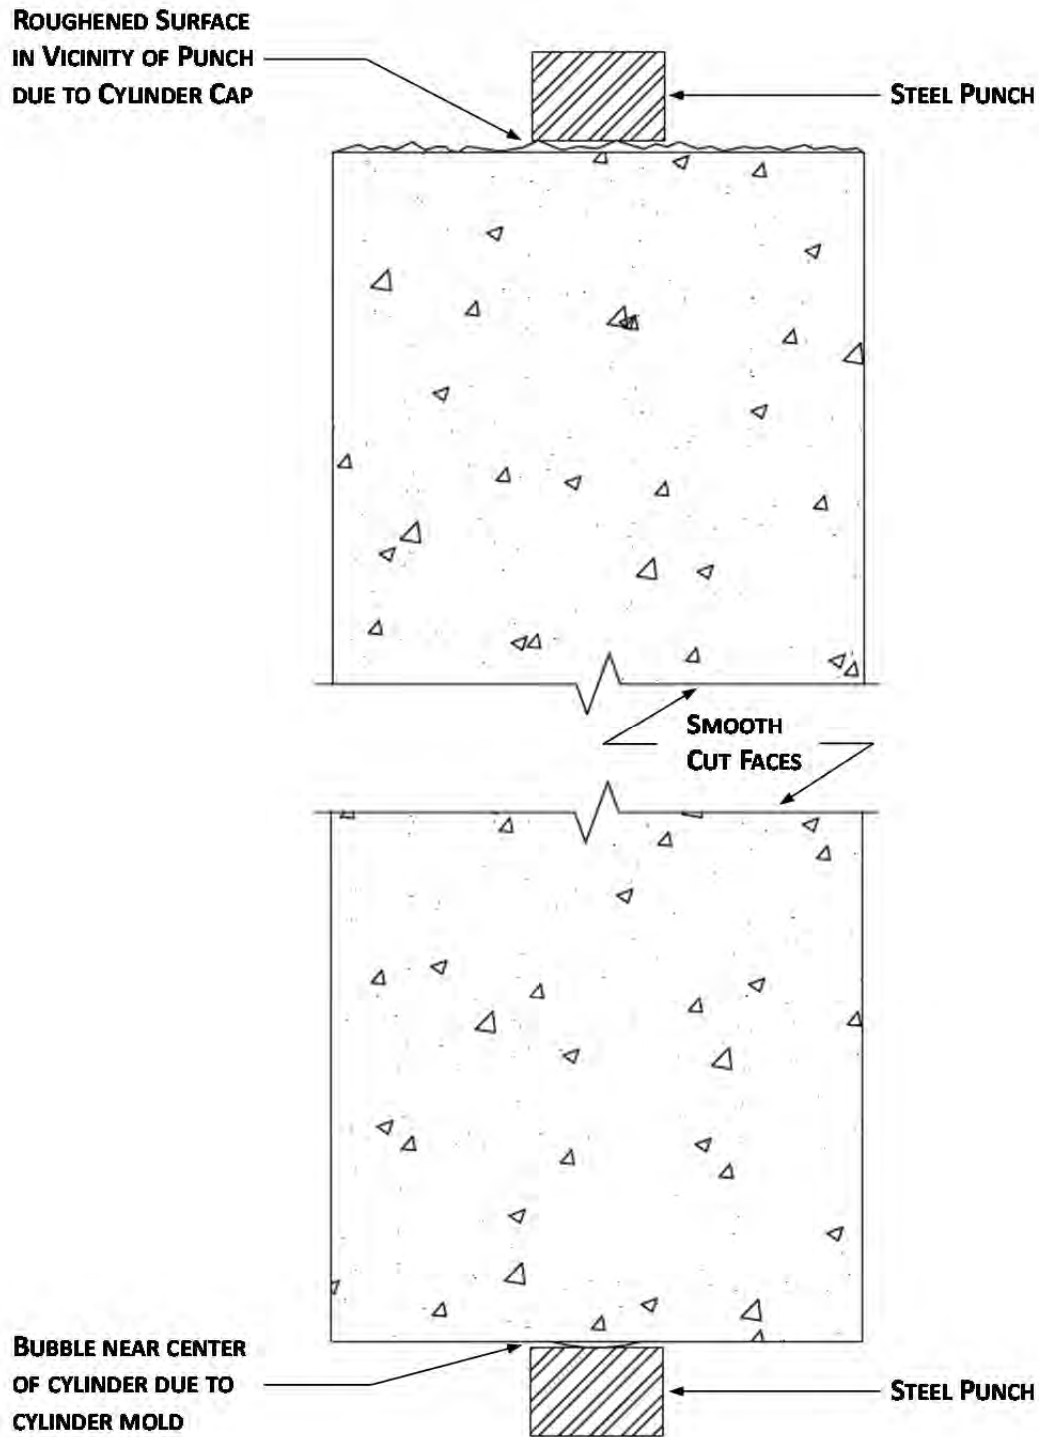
Schematic showing surface roughness on top and bottom surfaces of cylinder due to mold
